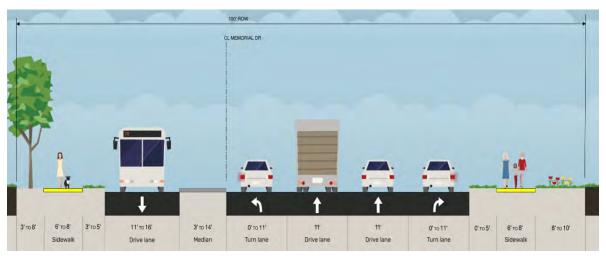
Proposed Typical Section – East Memorial Drive (Gessner Rd to Warrenton Dr)
